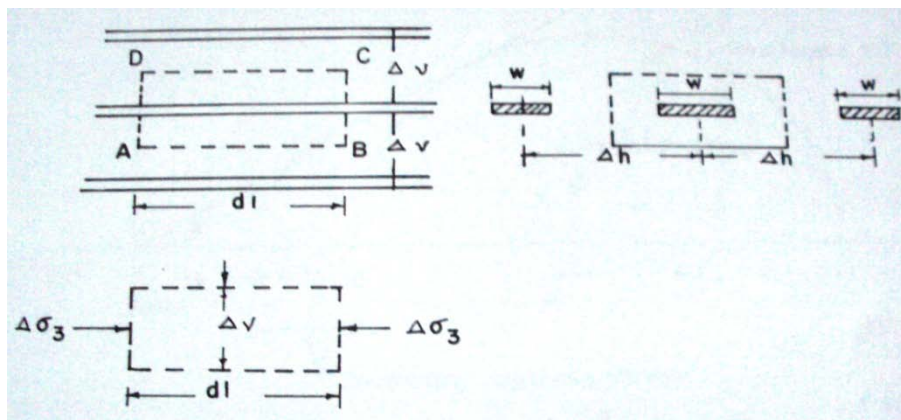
Confining Stress on Soil by Reinforcement^[13]
